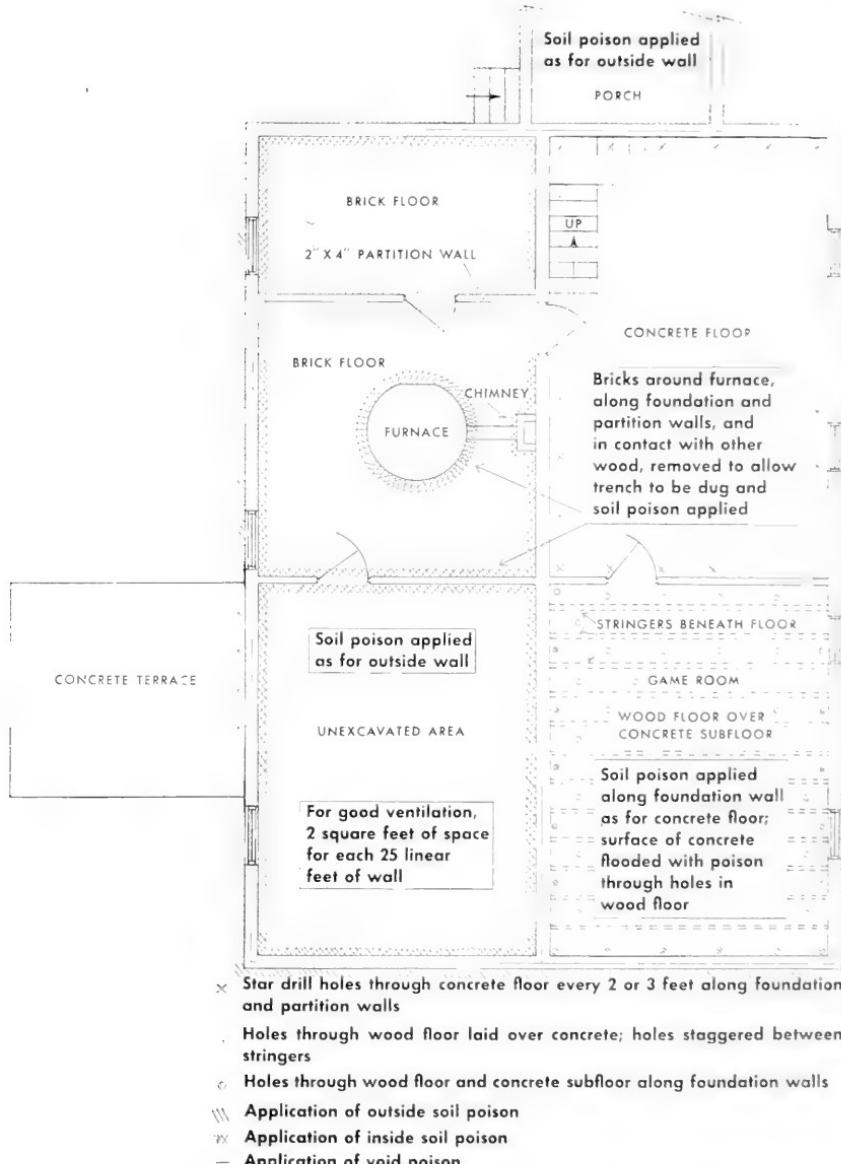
Basement floor plan showing where chemicals should be applied for control of termites. Treatment for a wood floor over concrete is about the same as for a concrete floor, plus flooding of entire surface between the wood and concrete with termite control chemical. Any chemicals used inside the house should be non-odorous. A raised porch is treated as indicated at top of diagram. Thoroughness is especially needed in treating the area around the heating unit, where termites are likely to be numerous.
